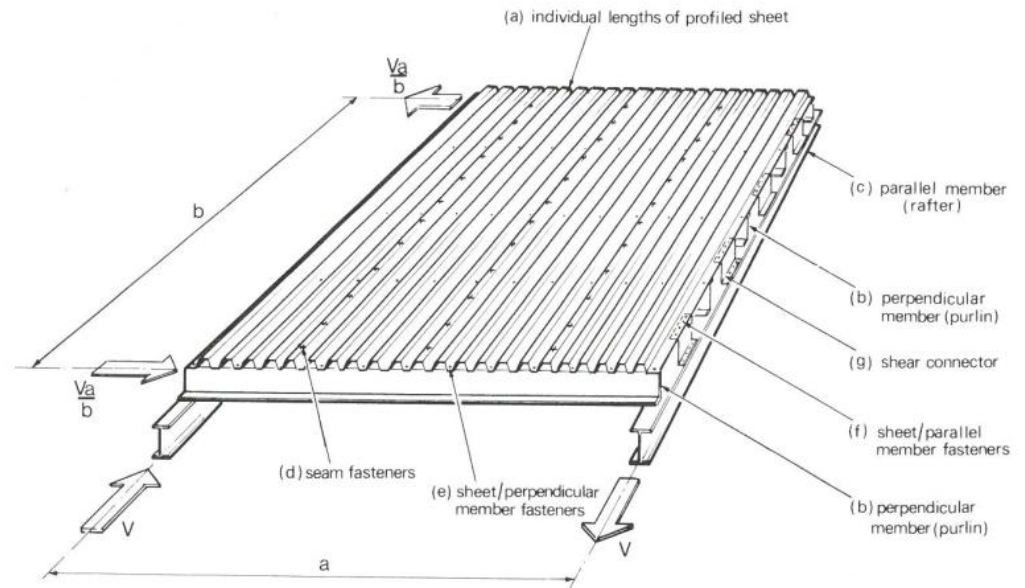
Basic arrangement of an individual diaphragm (J.M. Davies and E.R. Bryan, 1982, P.19)
